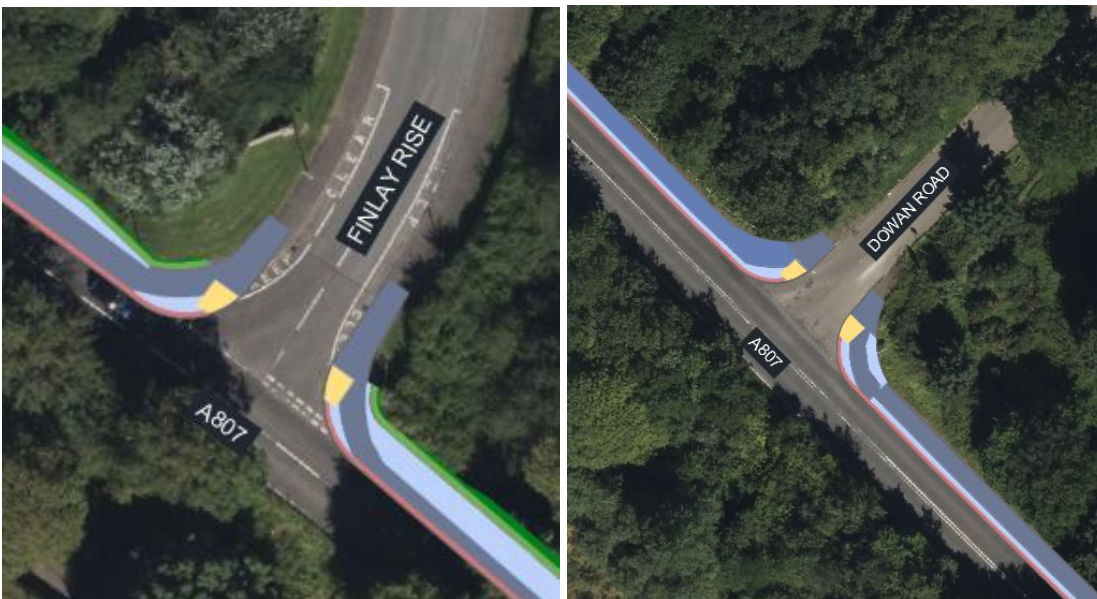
Finlay Rise and Dowan Road junction improvements
